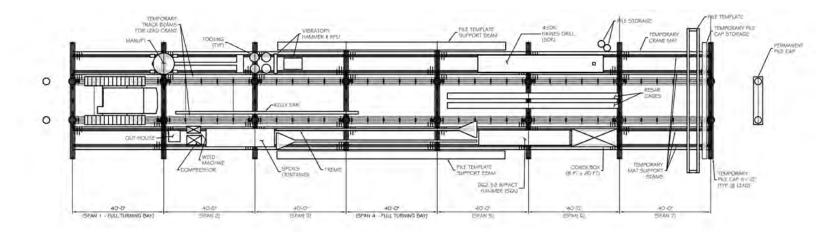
Plan View of Leading Crane on Access Trestle
